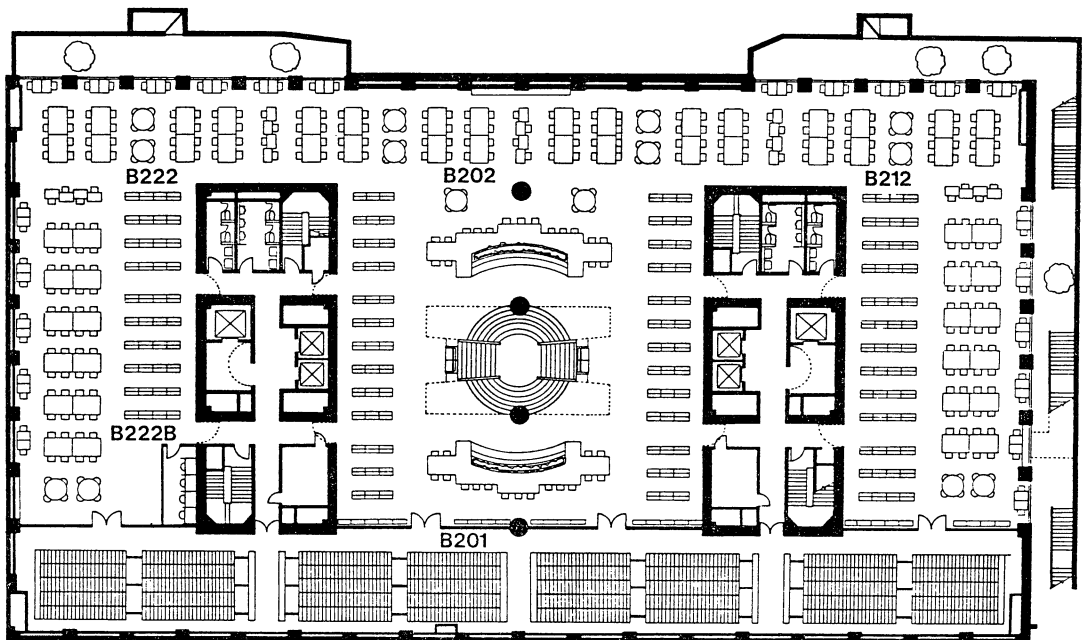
The floor plan of the second basement, housing the undergraduate library.
